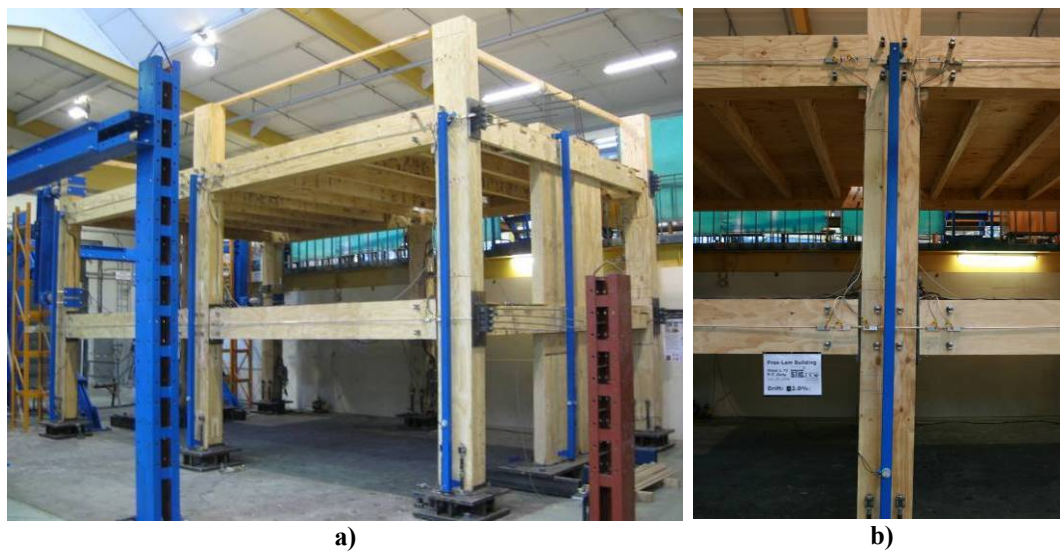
Frame at 2.0% Drift a) 3D view b) S column
